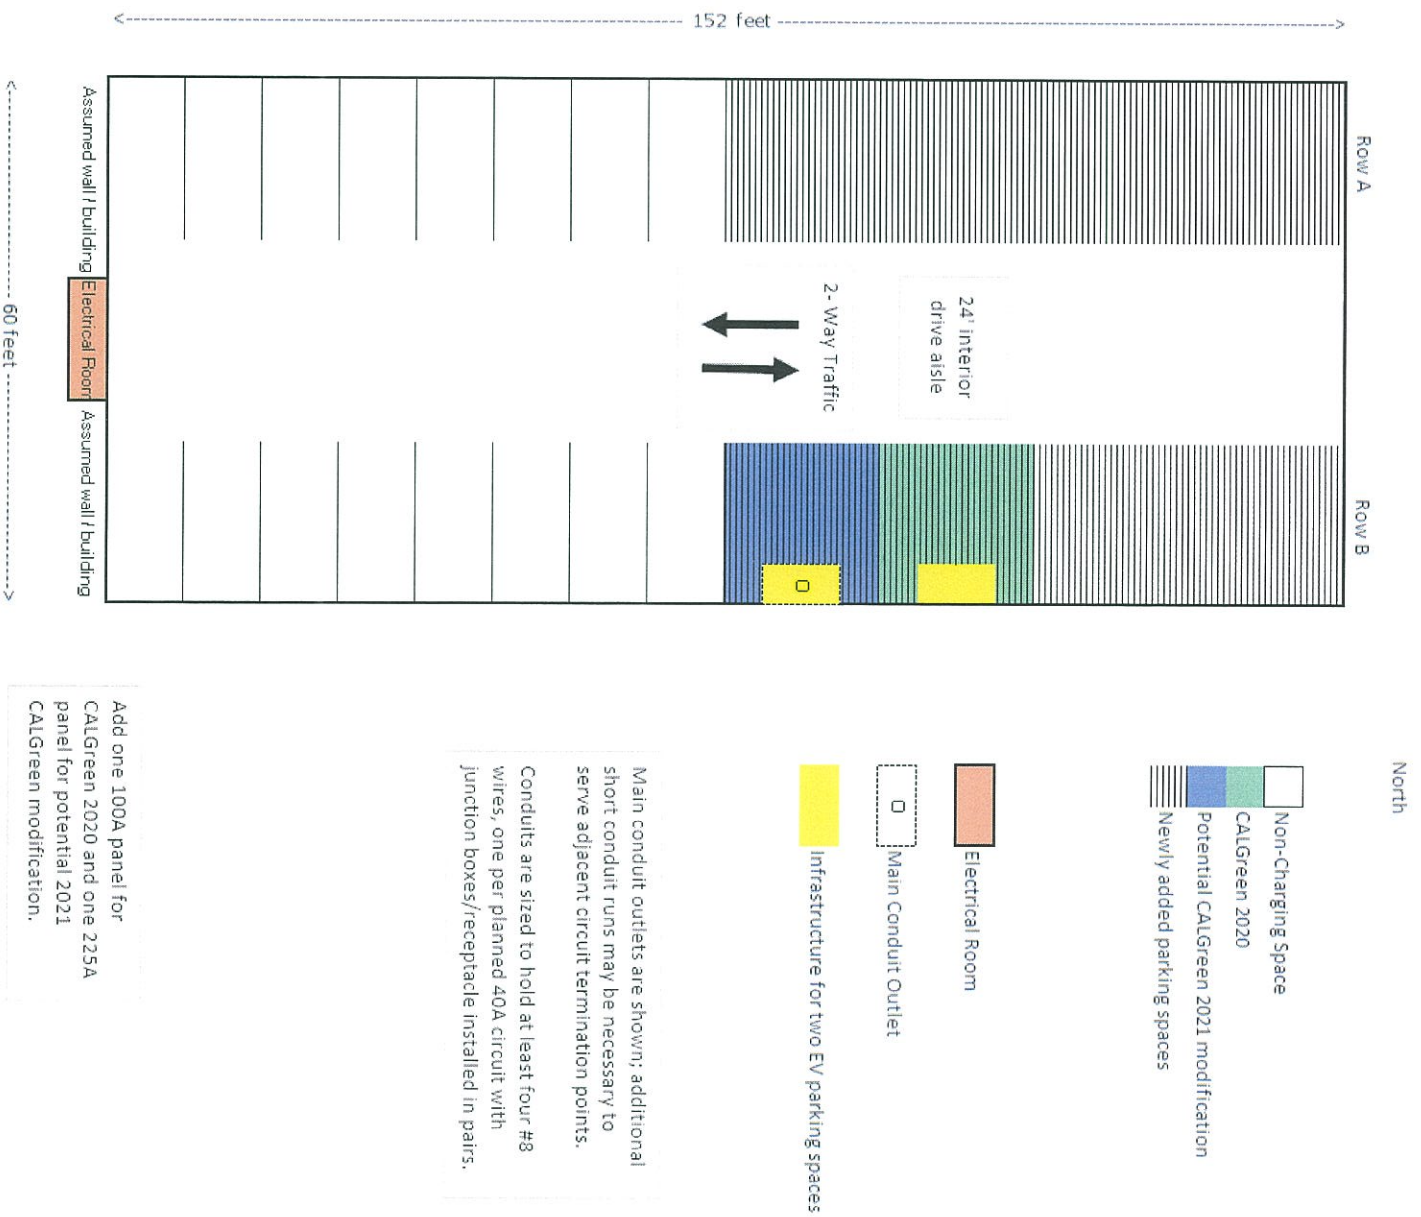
Parking addition scenario of small retail/restaurant with 32 parking spaces
